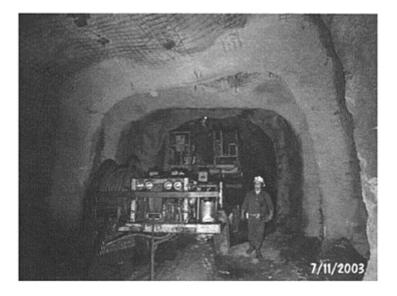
Tunnel repairs, rockburst support and reinforced arches.
